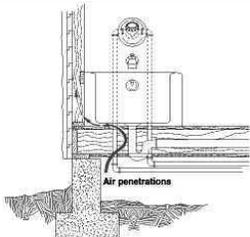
Block air movement up into bathtub openings with stiff cardboard or gypsum board, caulked and nailed to floor members.
